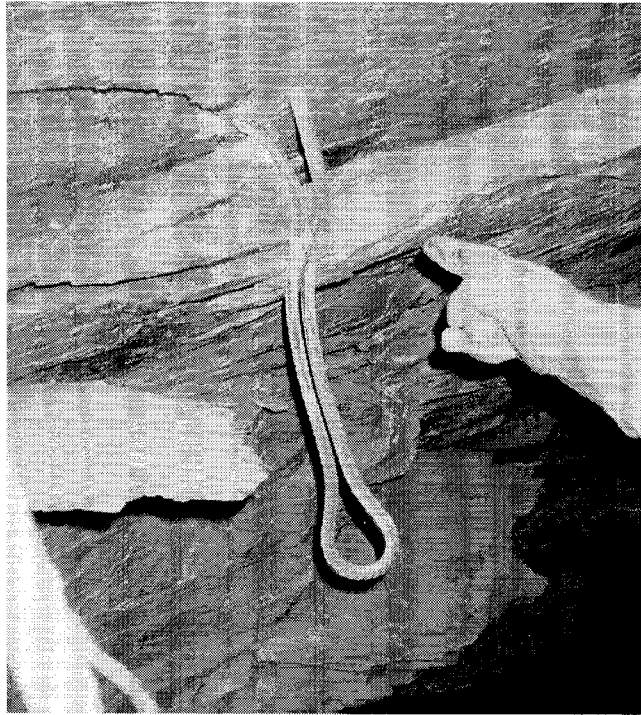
Kinked shepherd's crook rebar observed in the hangingwall of the 34K footwall drive between Sites B and C. Some bars had been sheared by the movement along bedding planes.
